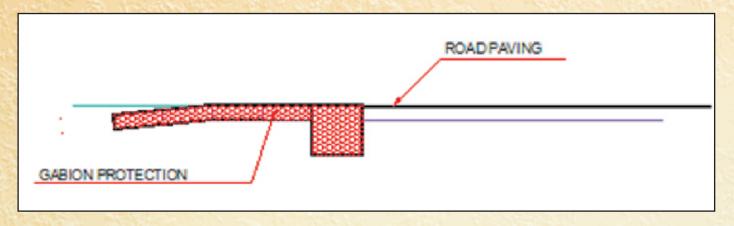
Typical different scheme of culvert with Gabion Retaining wall
